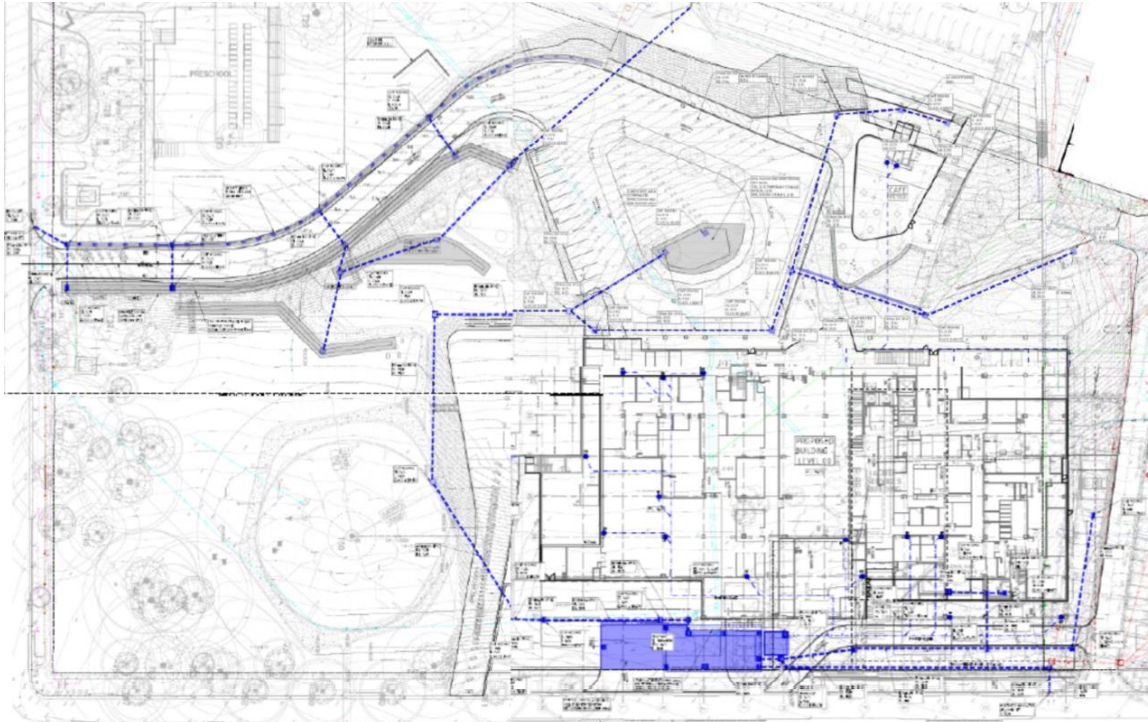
Stormwater system upgrades and adjustments (Bonacci)
